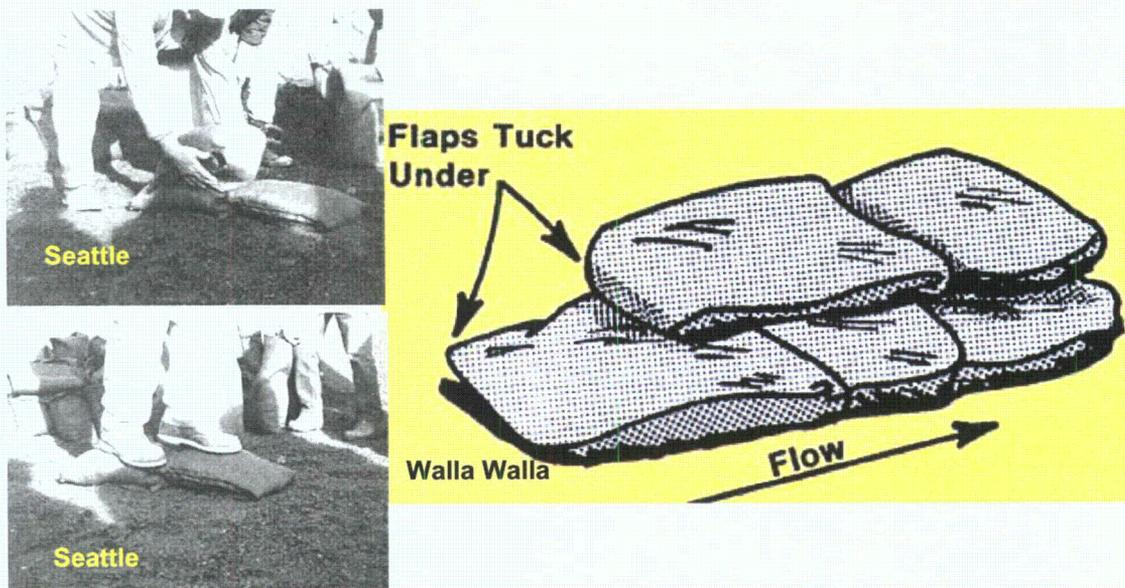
Walla Walla and Seattle Districts' design for placing sandbags
